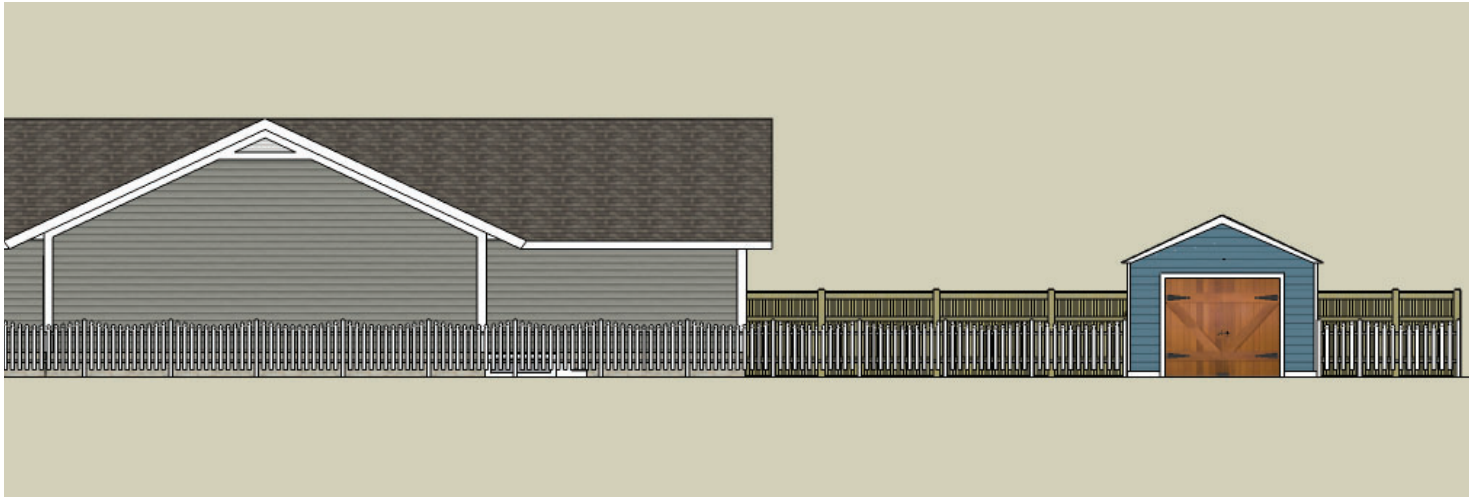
An example of a front gable garage located on a corner lot that could be reviewed under the ACoA process. Note how the roof form and pitch of the garage match the gable of the main dwelling.
